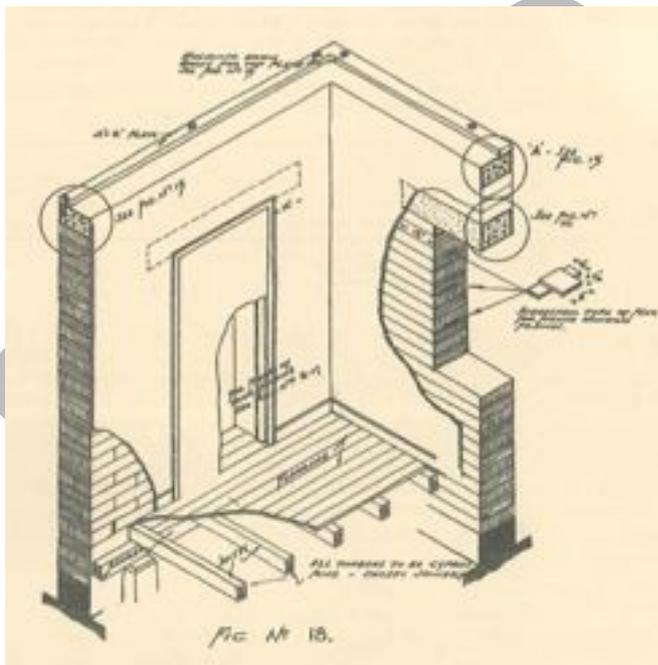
Typical construction for earth building showing concrete ring beam. Homes of Earth (c195-?), Qld Housing Commission; Fig 18, p7
